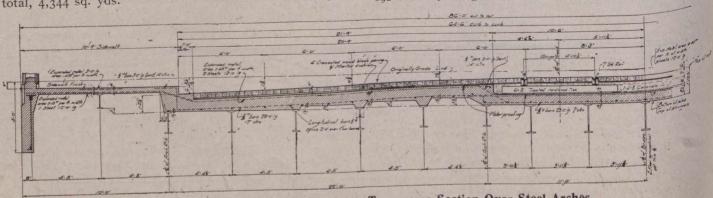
Upper Deck Slab, Half Transverse Section Over Steel Arches.
